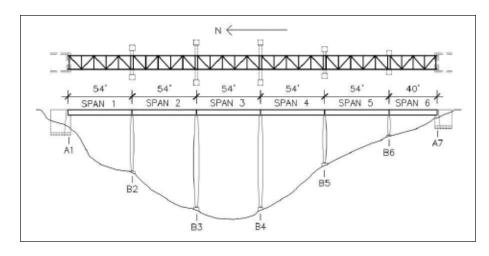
Bridge arrangement, Lobato Bridge. Sketch by J. R. Harris & Co., Denver.
